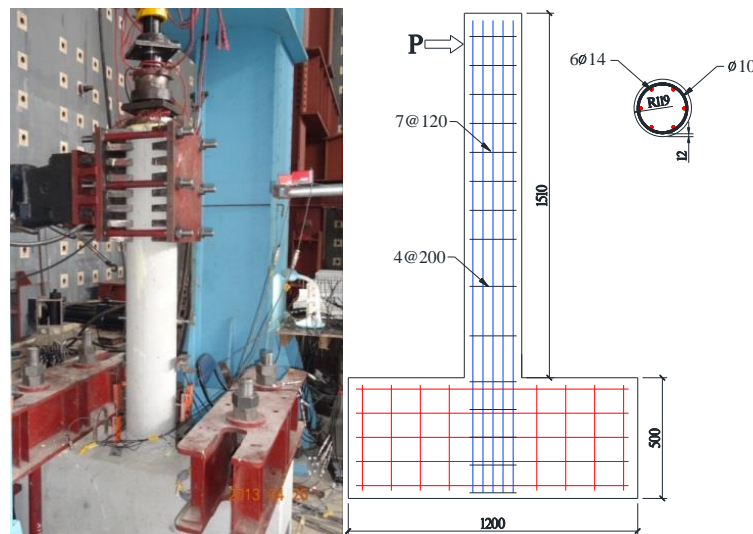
The photo of RC specimen and its reinforcing detail.
